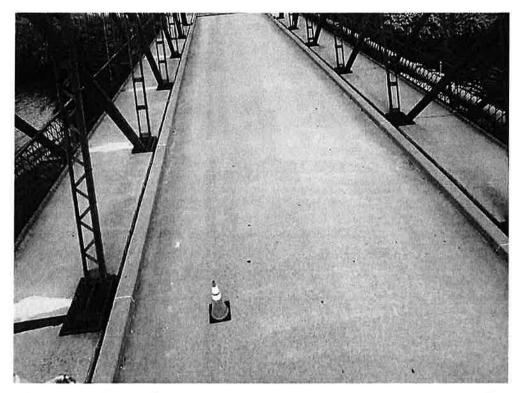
Wearing surface, span 2 shown, looking west - random insignificant cracks.
